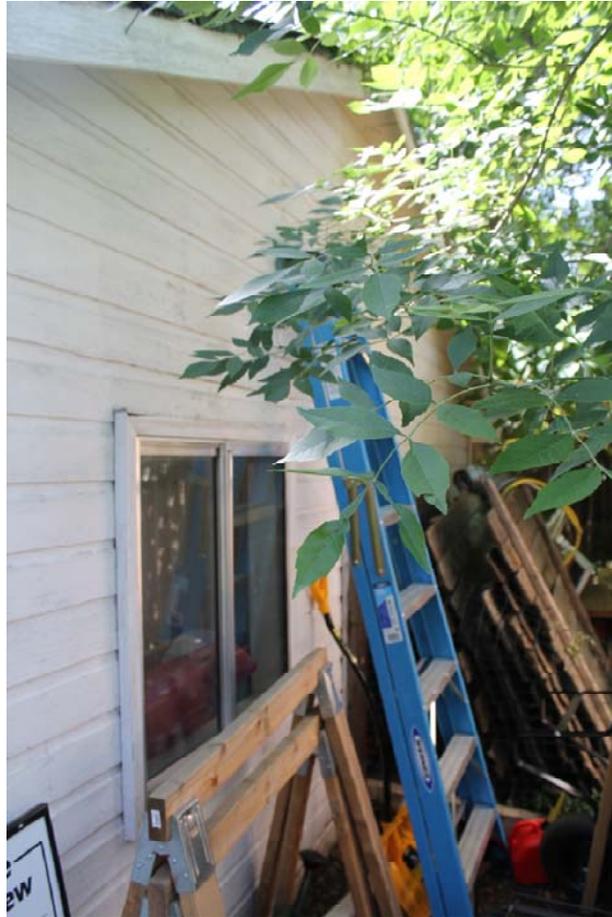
Accessory building, west elevation, 2515 7th St., 2014
